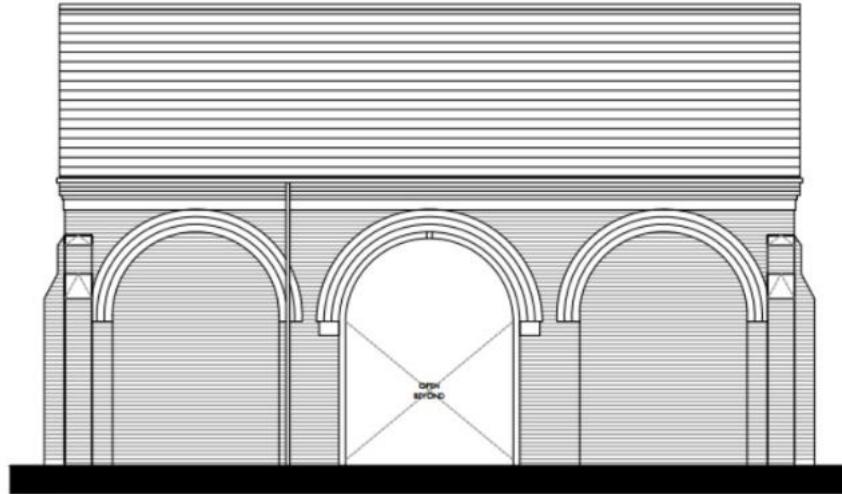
Current Existing North West Elevation showing the existing central entrance
